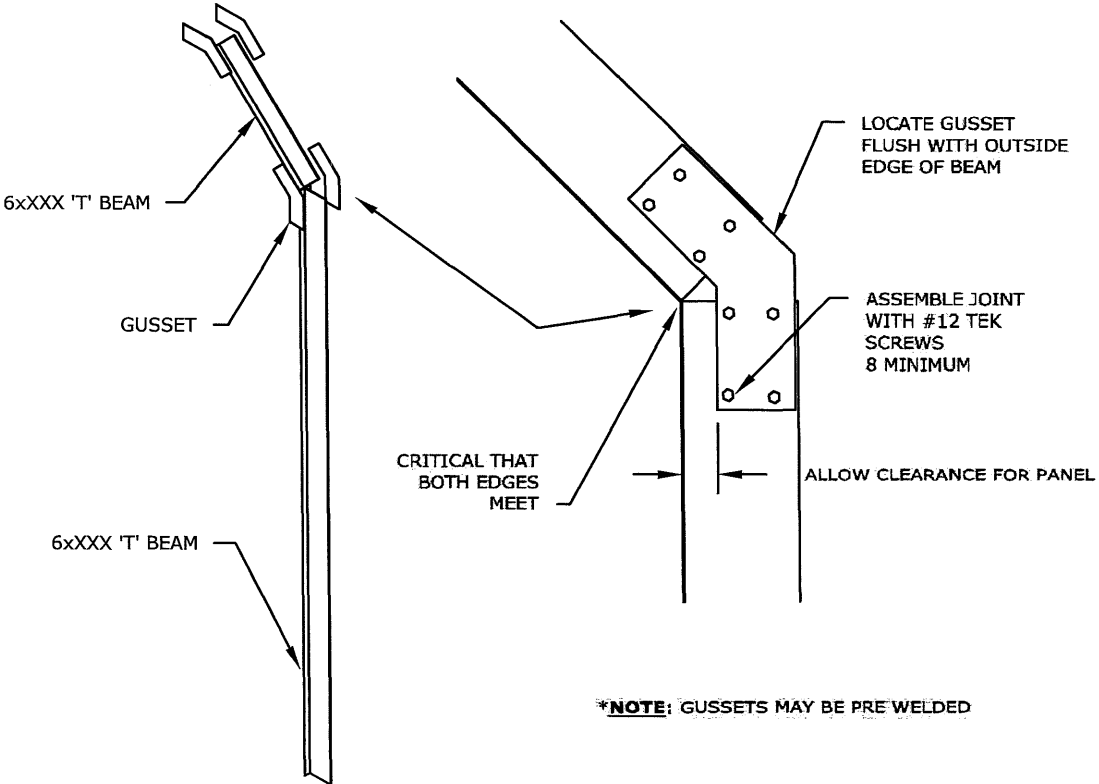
ASSEMBLY OF 'T' BEAM SECTIONS
